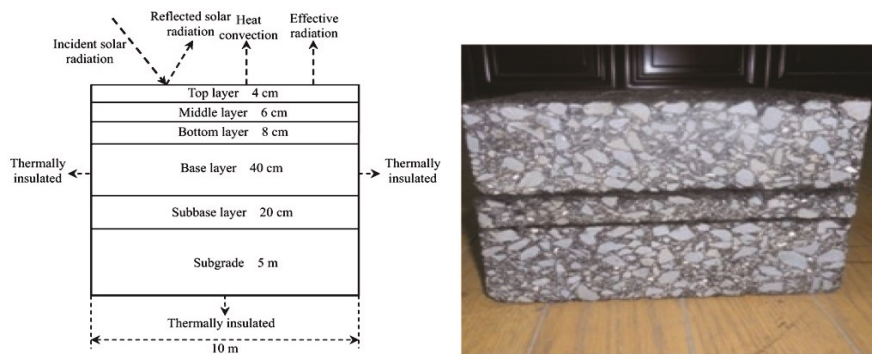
36: Asphalt pavement design proposed by Du Yinfei et al.
